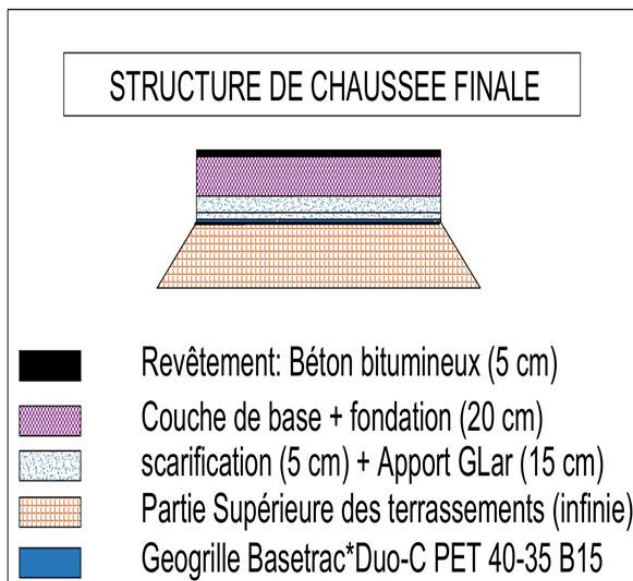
Structural cross-section of the reinforced pavement (layers: asphalt, base + sub-base, sub-grade, sub-soil)
